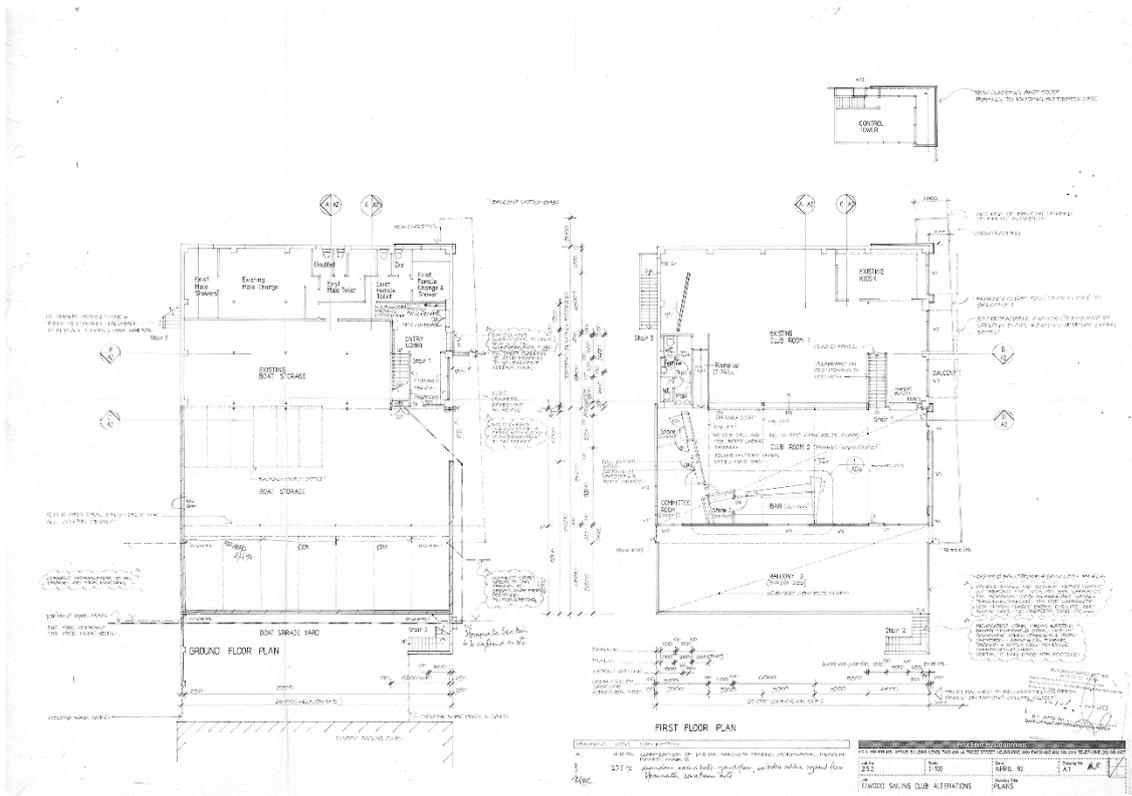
Floor plans by Peter Elliott Architects, dated 1992 (Source: City of St Kilda)
